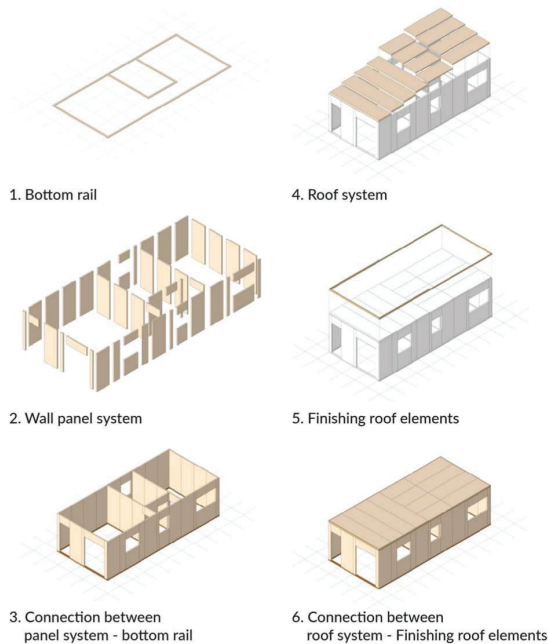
Assembly process of the self-construction housing kit for a SU.PRE.MO. 46m² modular house.
